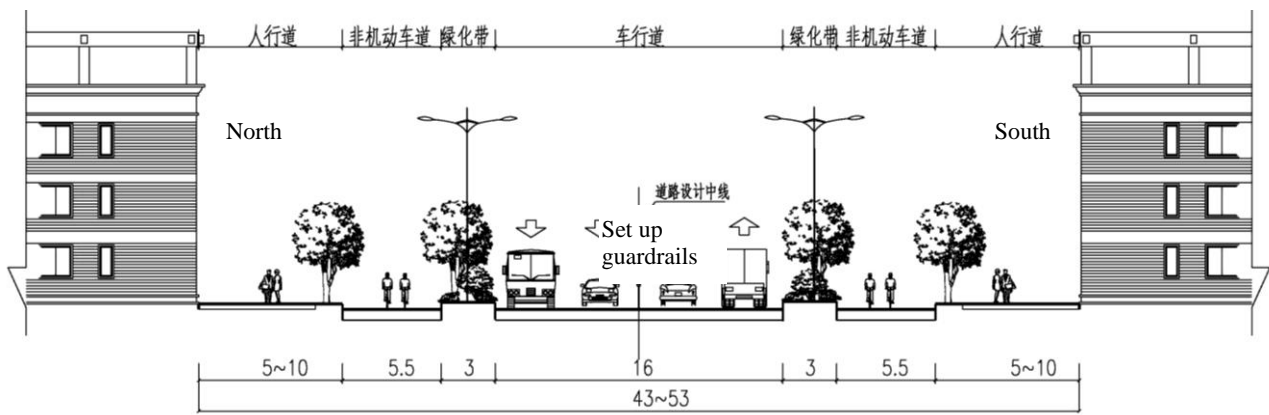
Reconstructed Cross Section of Jiefang Avenue (Binhe Avenue~Jinqiu Avenue)
